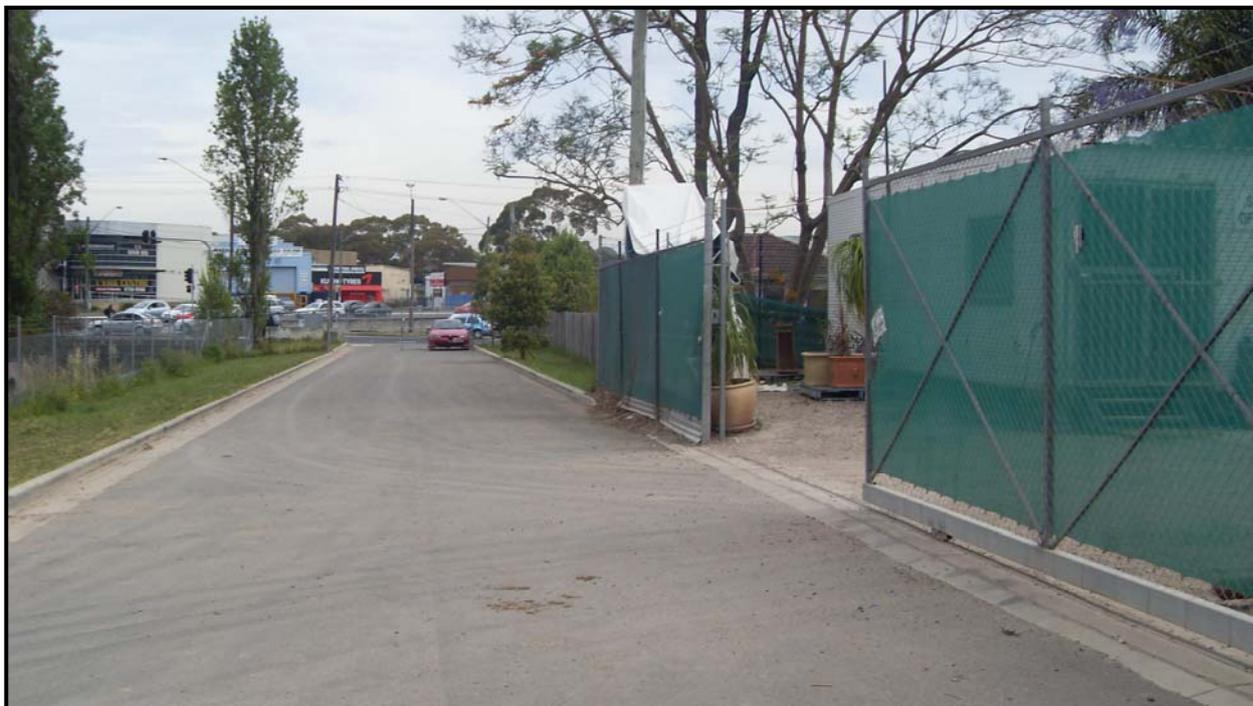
Photograph taken from the front (eastern) boundary of the subject site looking south toward Juno Parade, along the existing Right of Carriageway.
